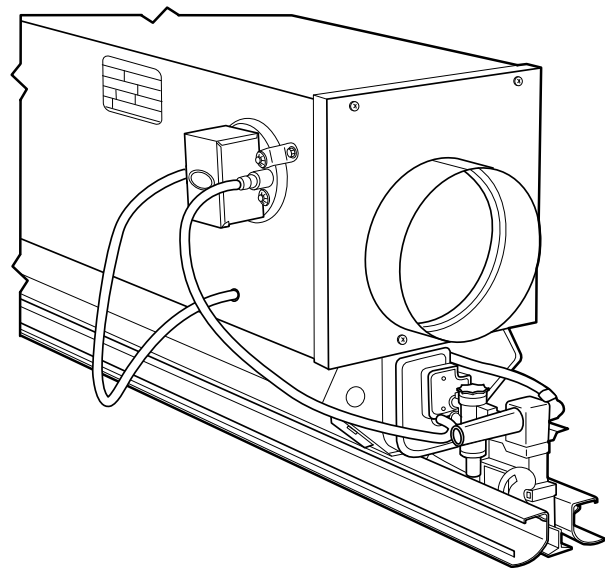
Electric Interlock Installed on Moduline Terminal
